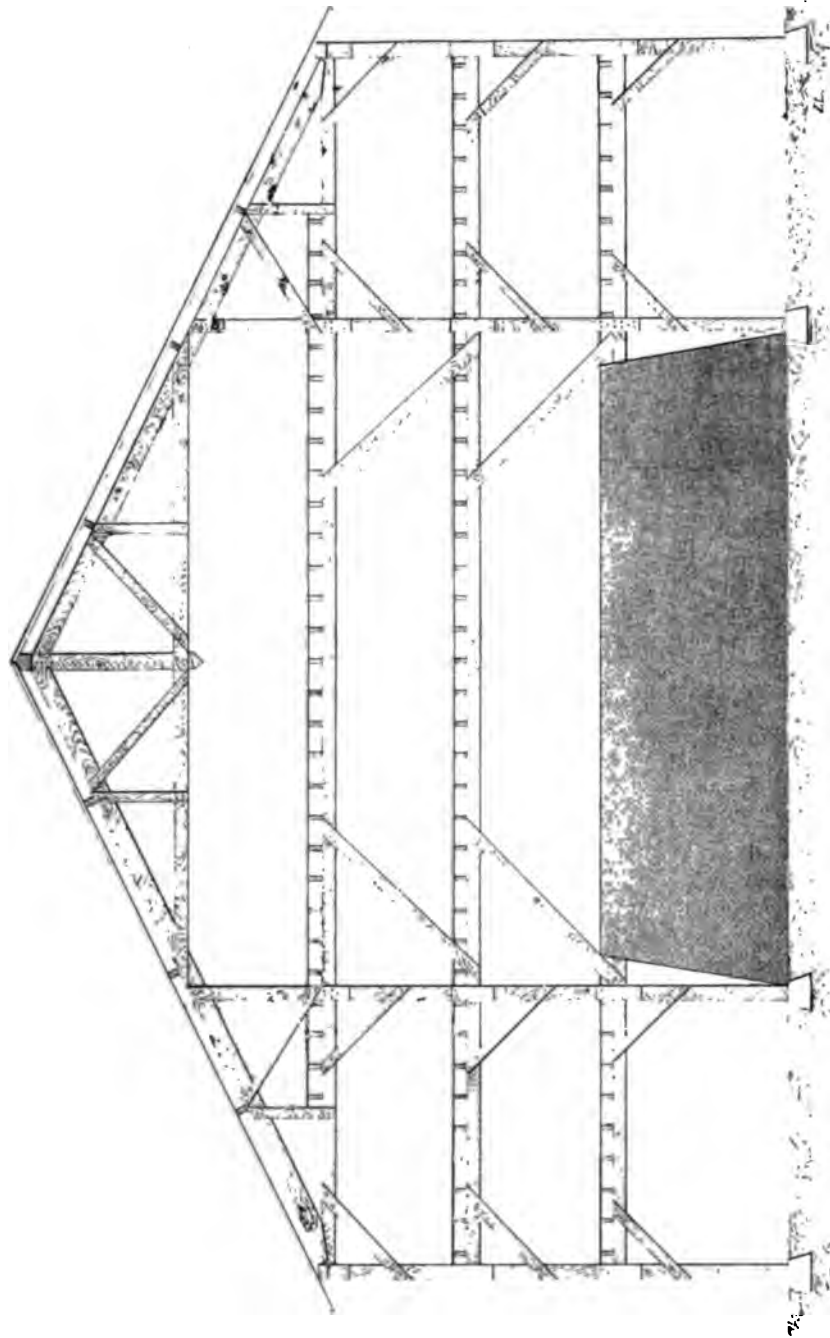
Building in Storeys for drying Bricks. (Scale of 8 millimetres to the metre.)
